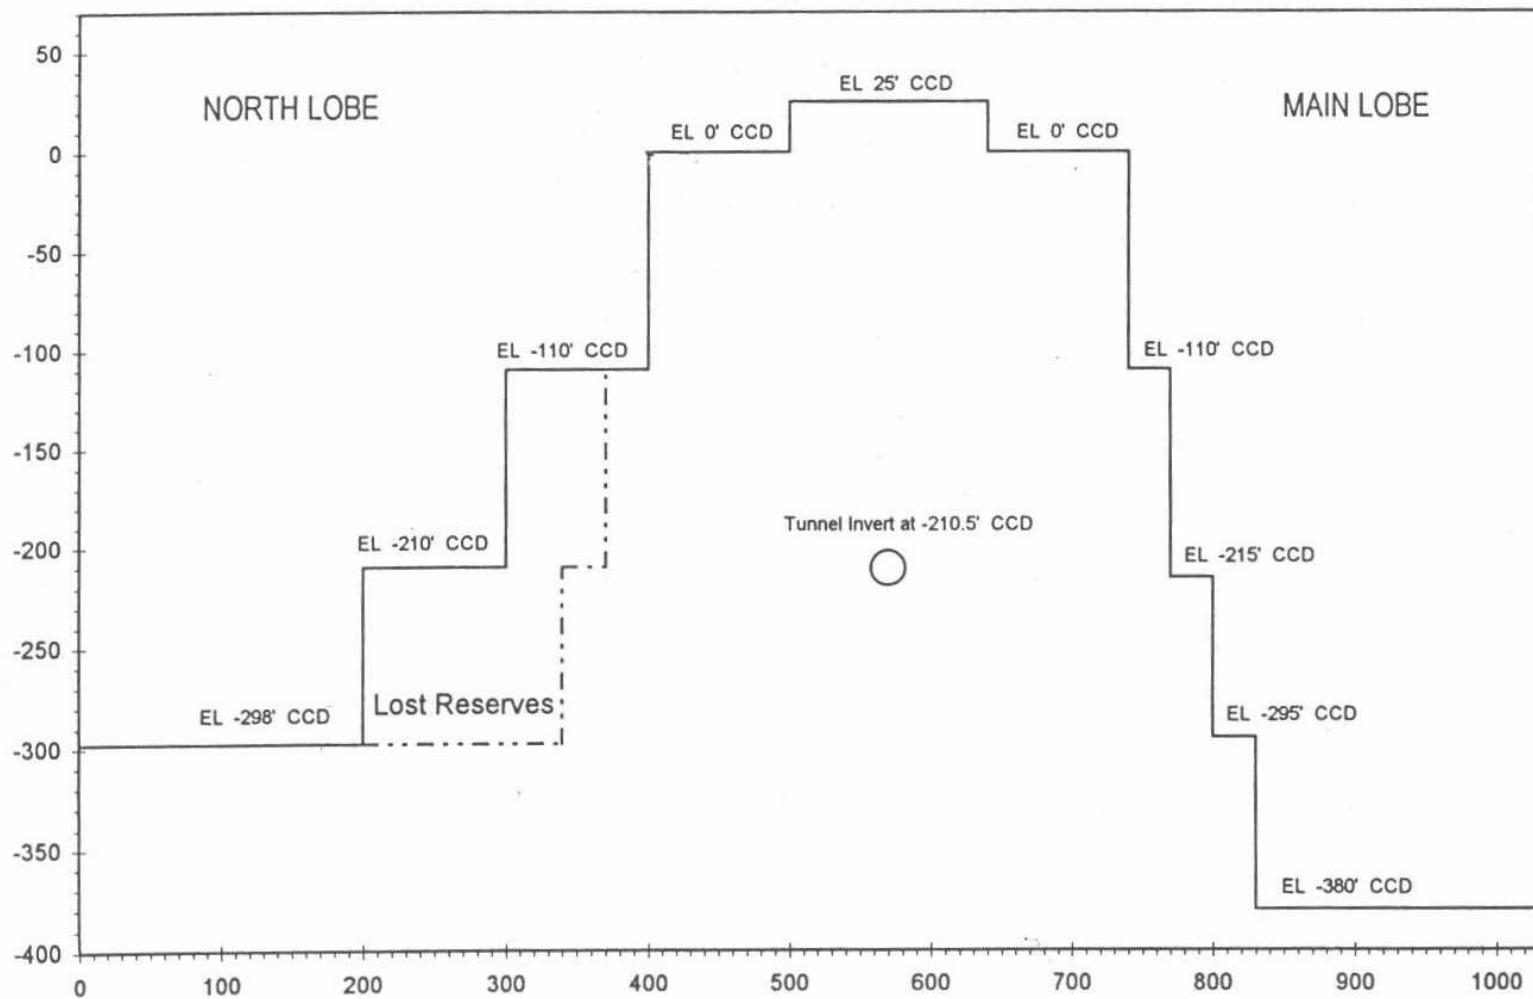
Cross Section of Rock Ridge Looking Eastward.
